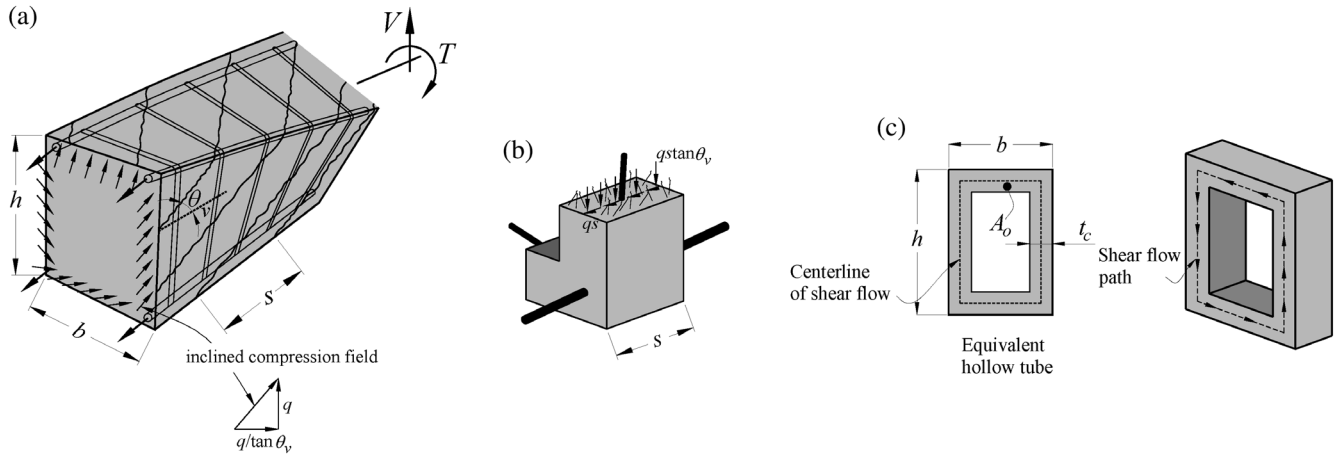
Cracked steel fiber-reinforced concrete (SFRC) beam in torsion
